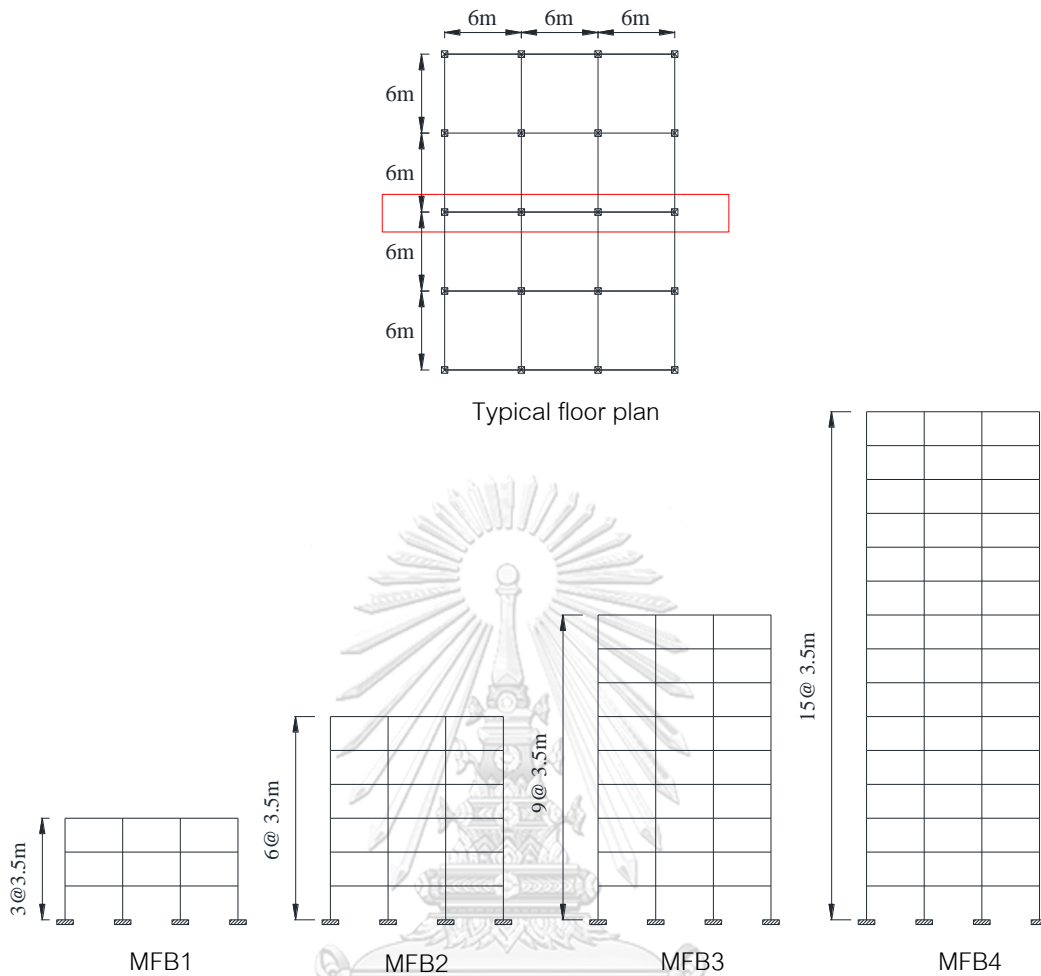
Floor plans and two-dimensional models of RC moment-frame buildings.
